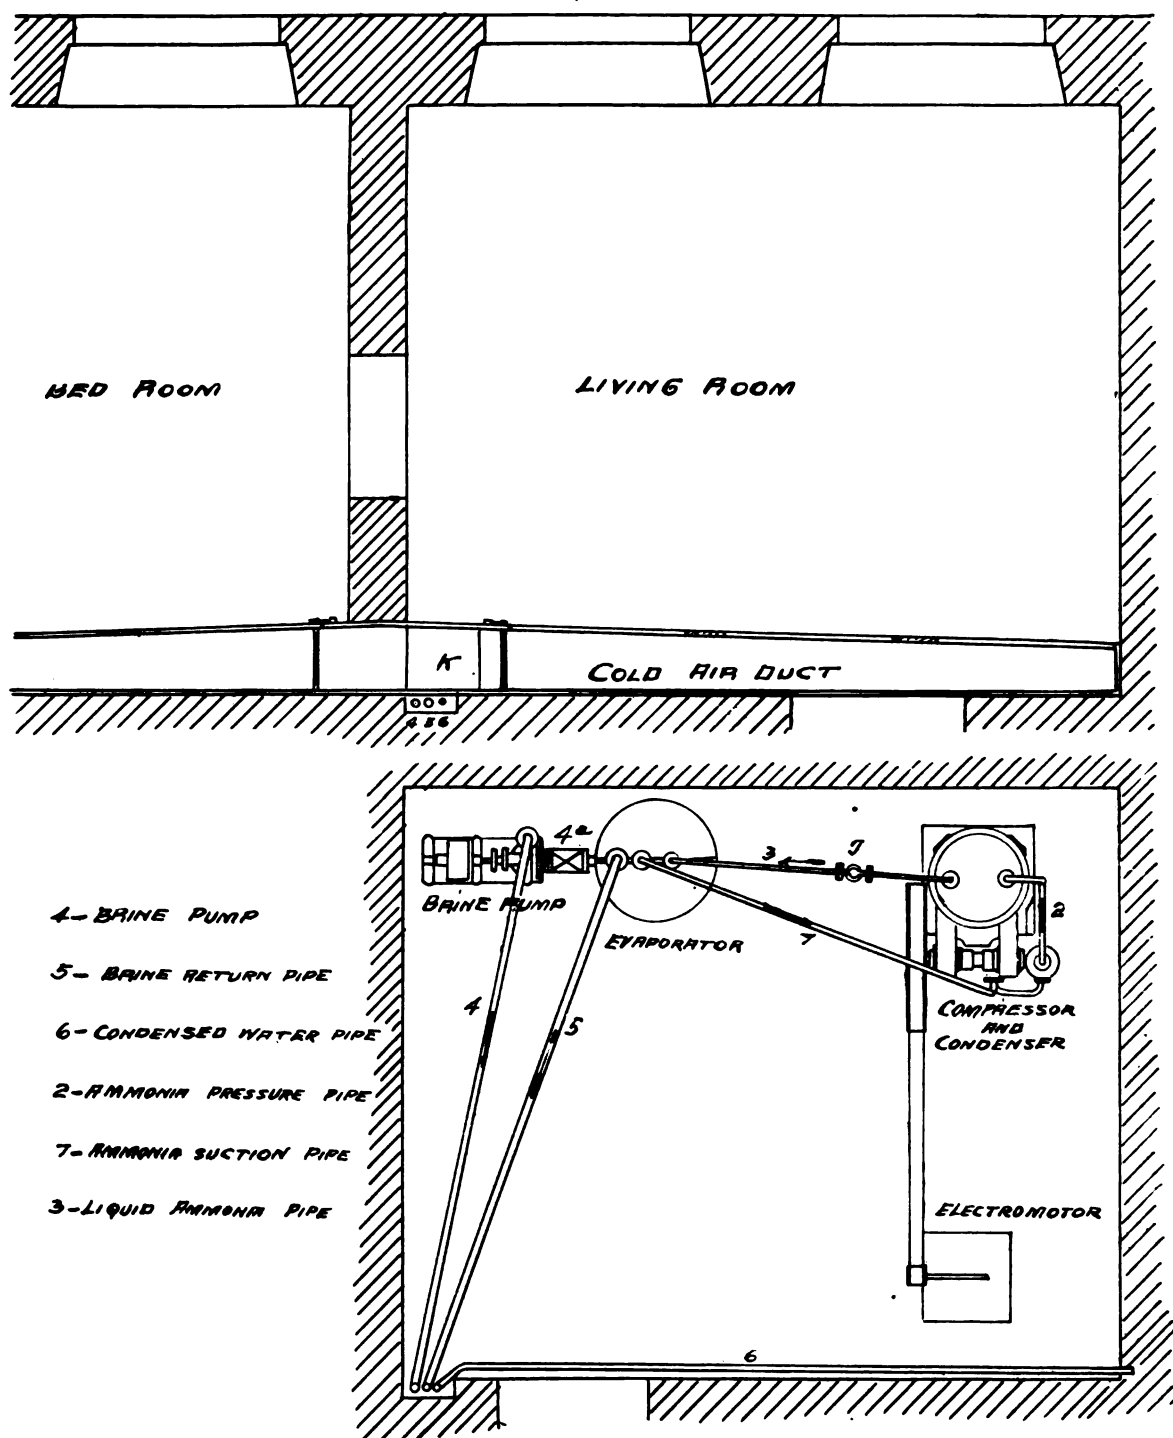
GROUND PLAN OF MACHINE HOUSE FOR COOLING DWELLINGS.
